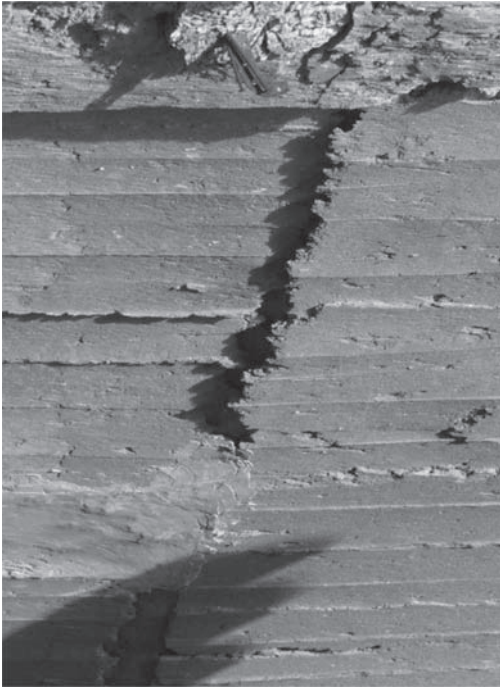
Detail of a gypsum thin wall built with formwork in a common house (Vegas & Mileto).
